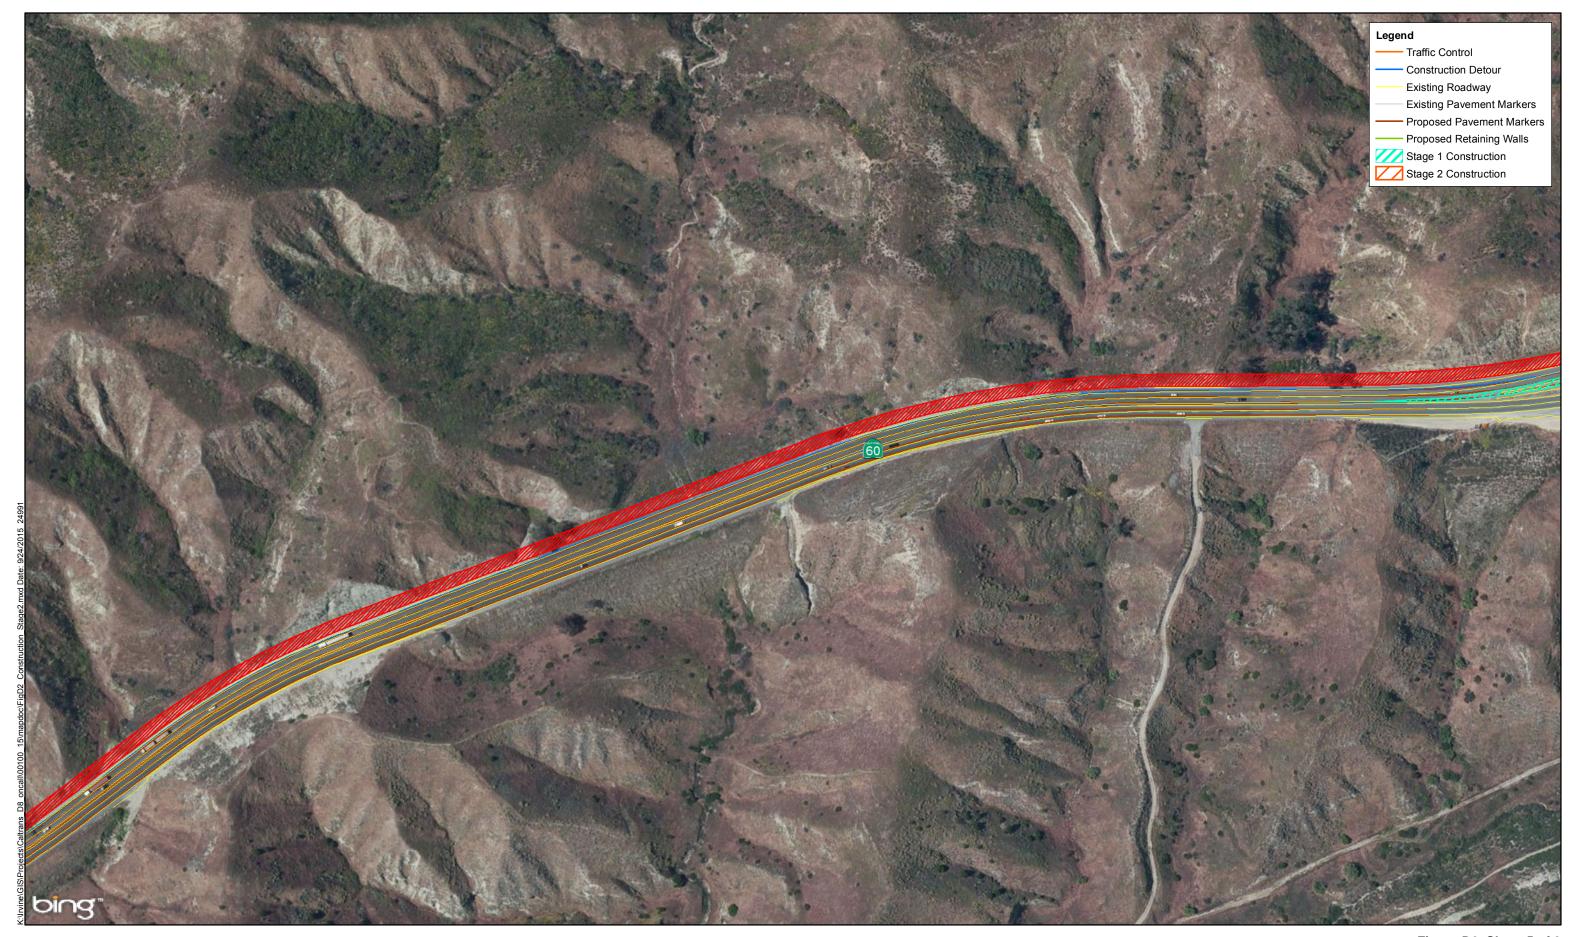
, Sheet 5 of 8 Construction Stage 2 State Route 60 Truck Lanes Project
